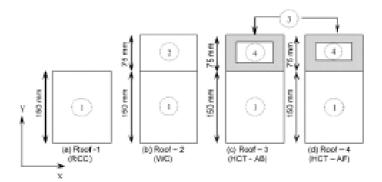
Roof structures under investigation (uniform width of 75 mm) (material: 1-RCC, 2-WC, 3-HCT, 4-air)
